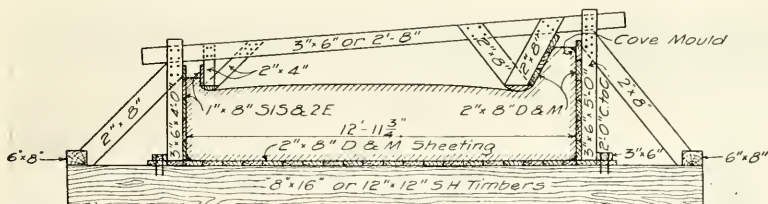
DETAILS OF FORM WORK FOR SLABS.
